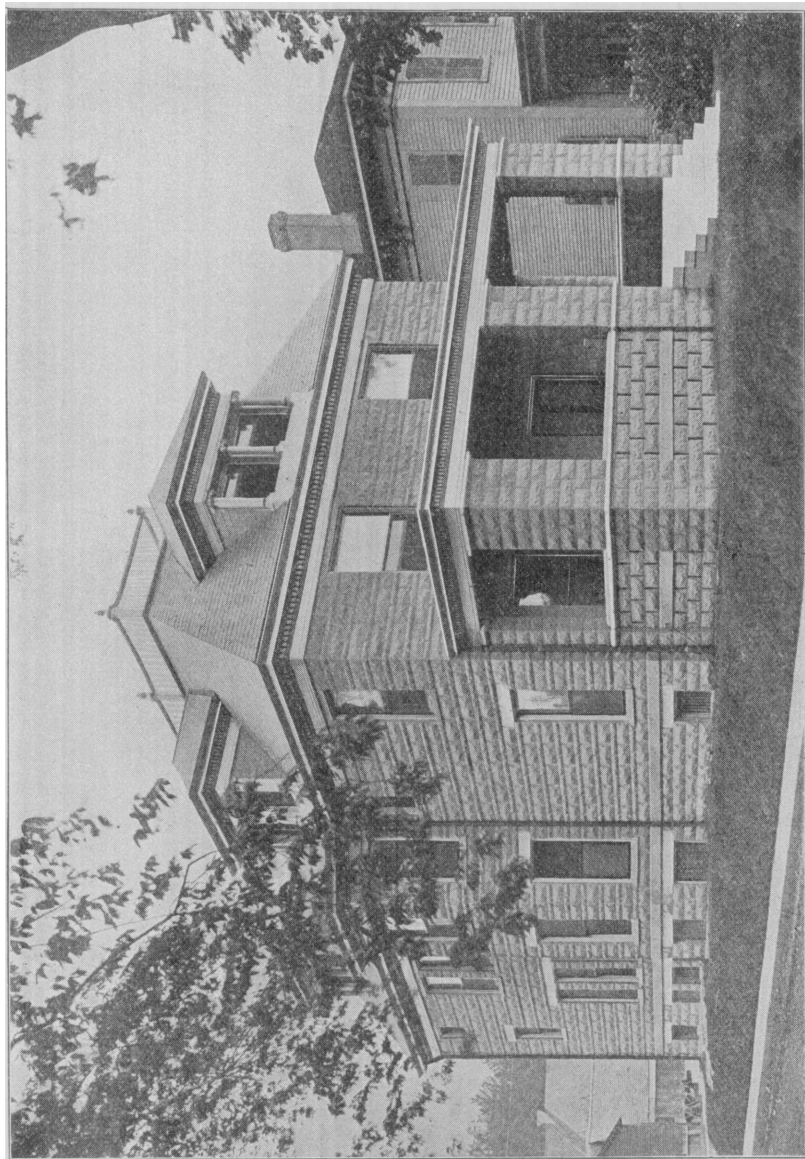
Residence Built of Concrete Blocks, Springfield, Ill.
